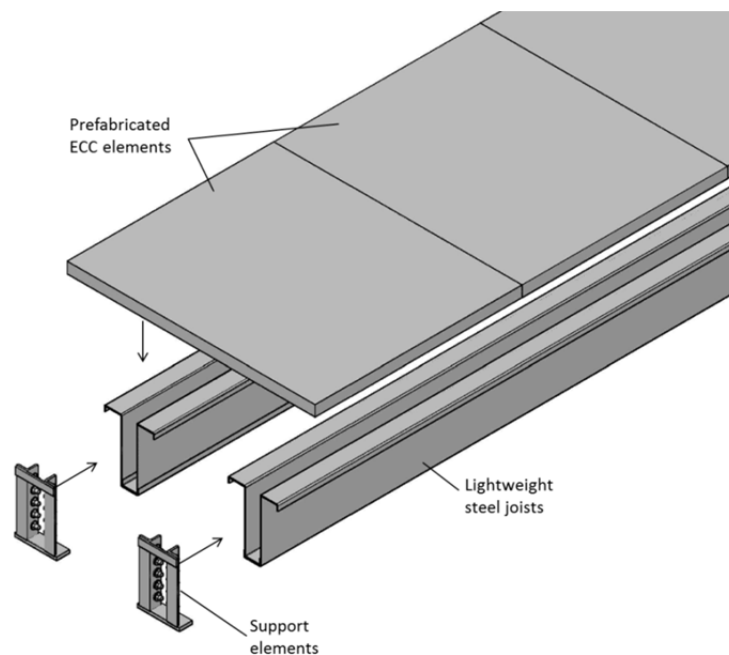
Prefabricated modular lightweight floor and roof panel MP
